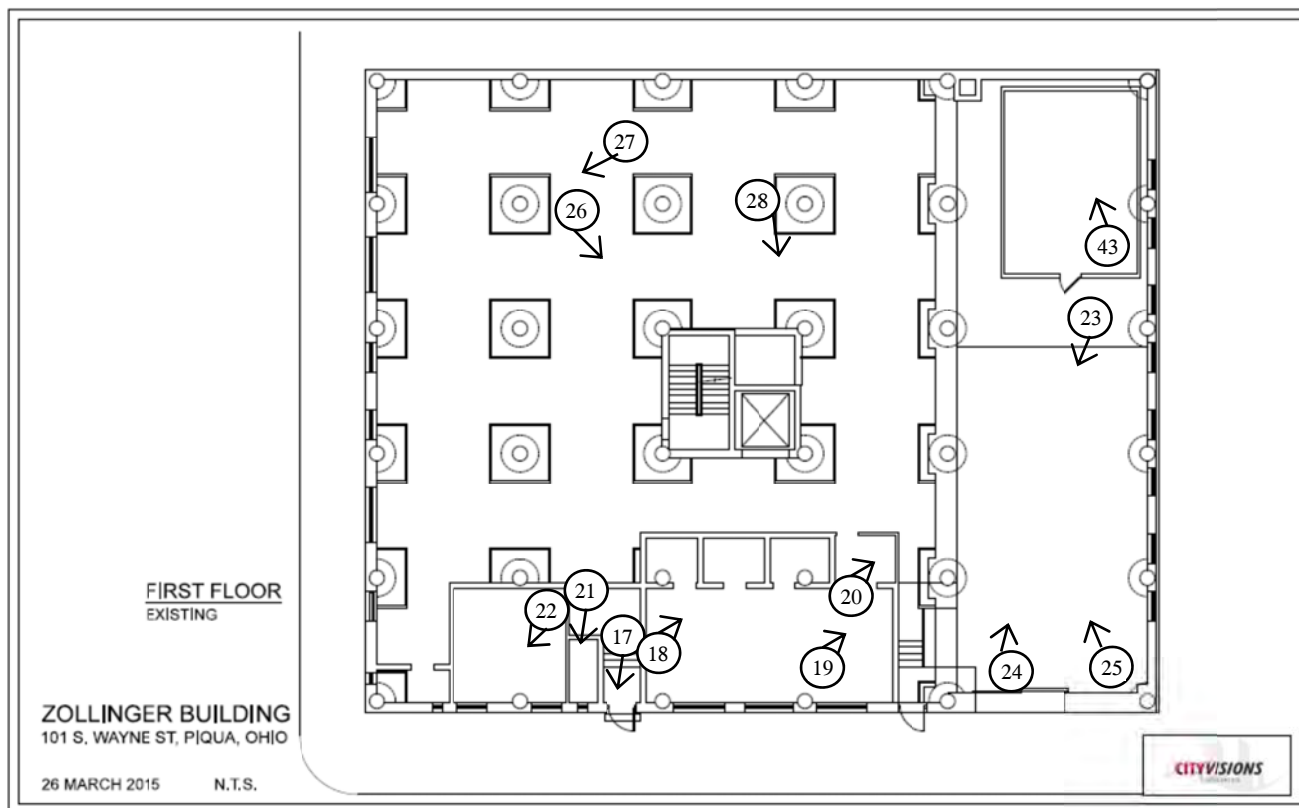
Existing First Floor Plan, Zollinger Building, showing locations of photographs 17-28 and 43 (City Visions, Inc.)
